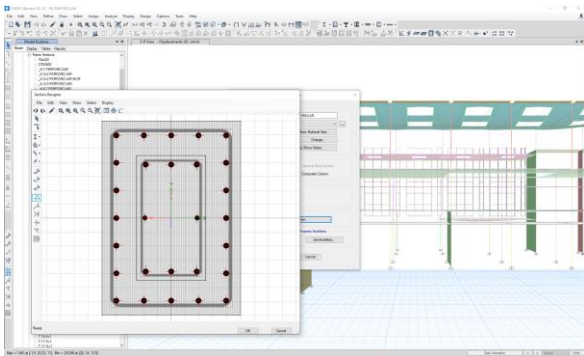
Modeling of the reinforced concrete jacketing layer and rebars of the columns
